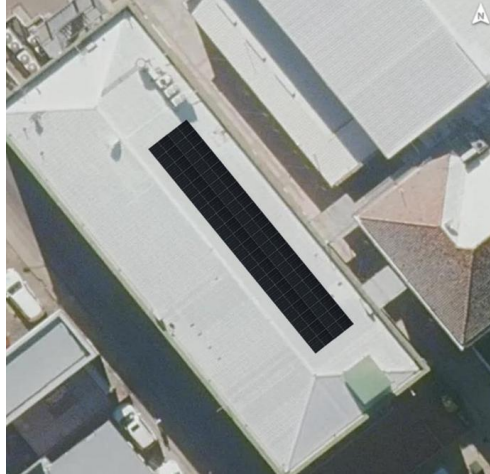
PEEL HOUSE – 20 kW SOLAR ON THE NORTH-EAST FACING ROOF
